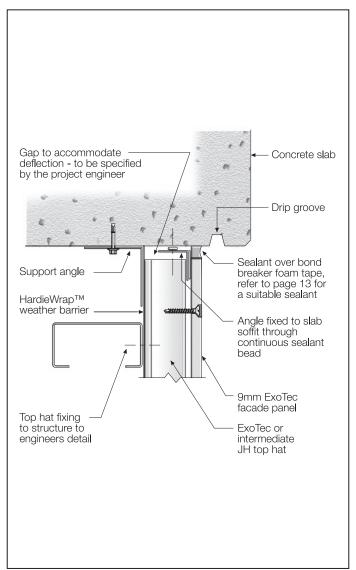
WALL DEFLECTION HEAD USED UNDER SLAB
